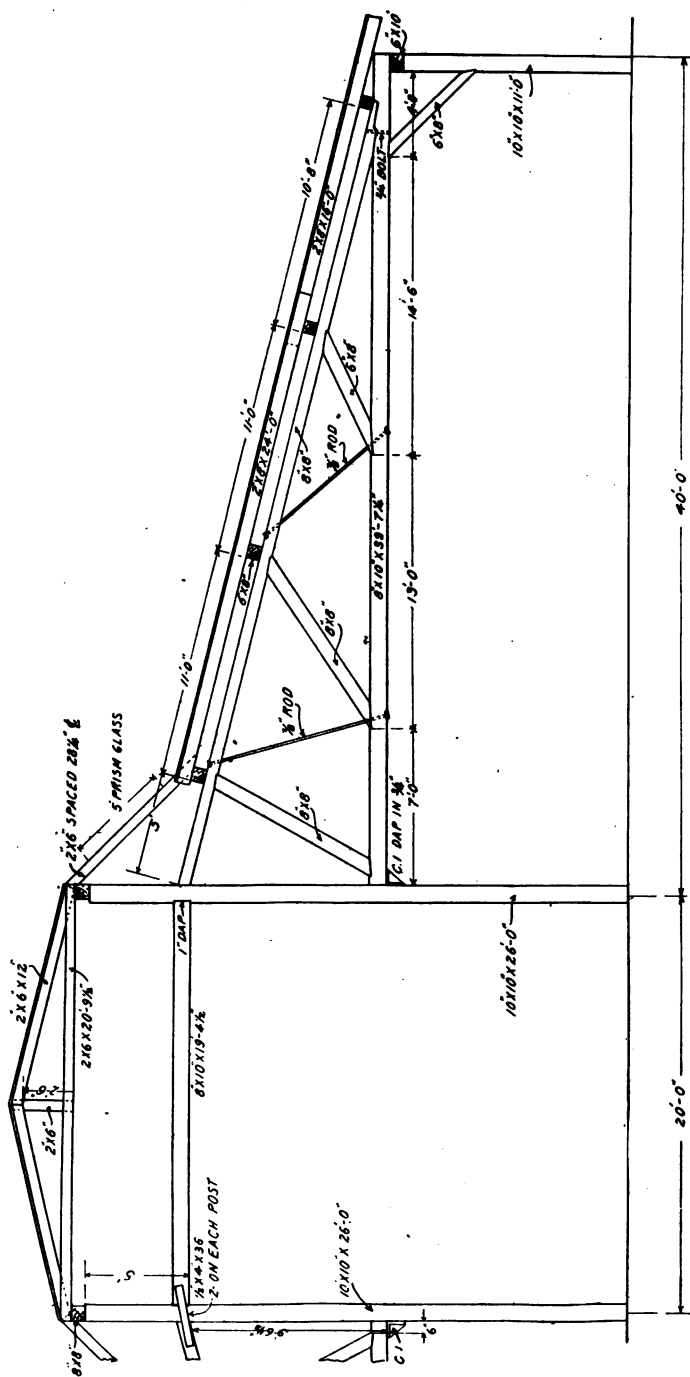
Partial end elevation of a planing mill building and design of trusses to eliminate interior posts.
